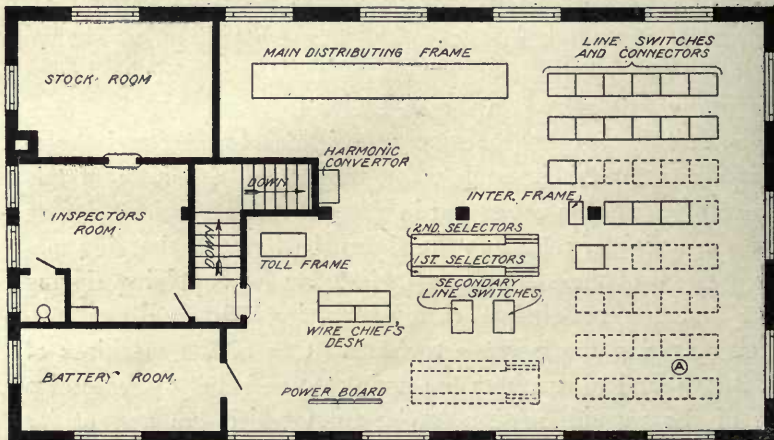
Floor Plan, Automatic Office, Lansing, Michigan
